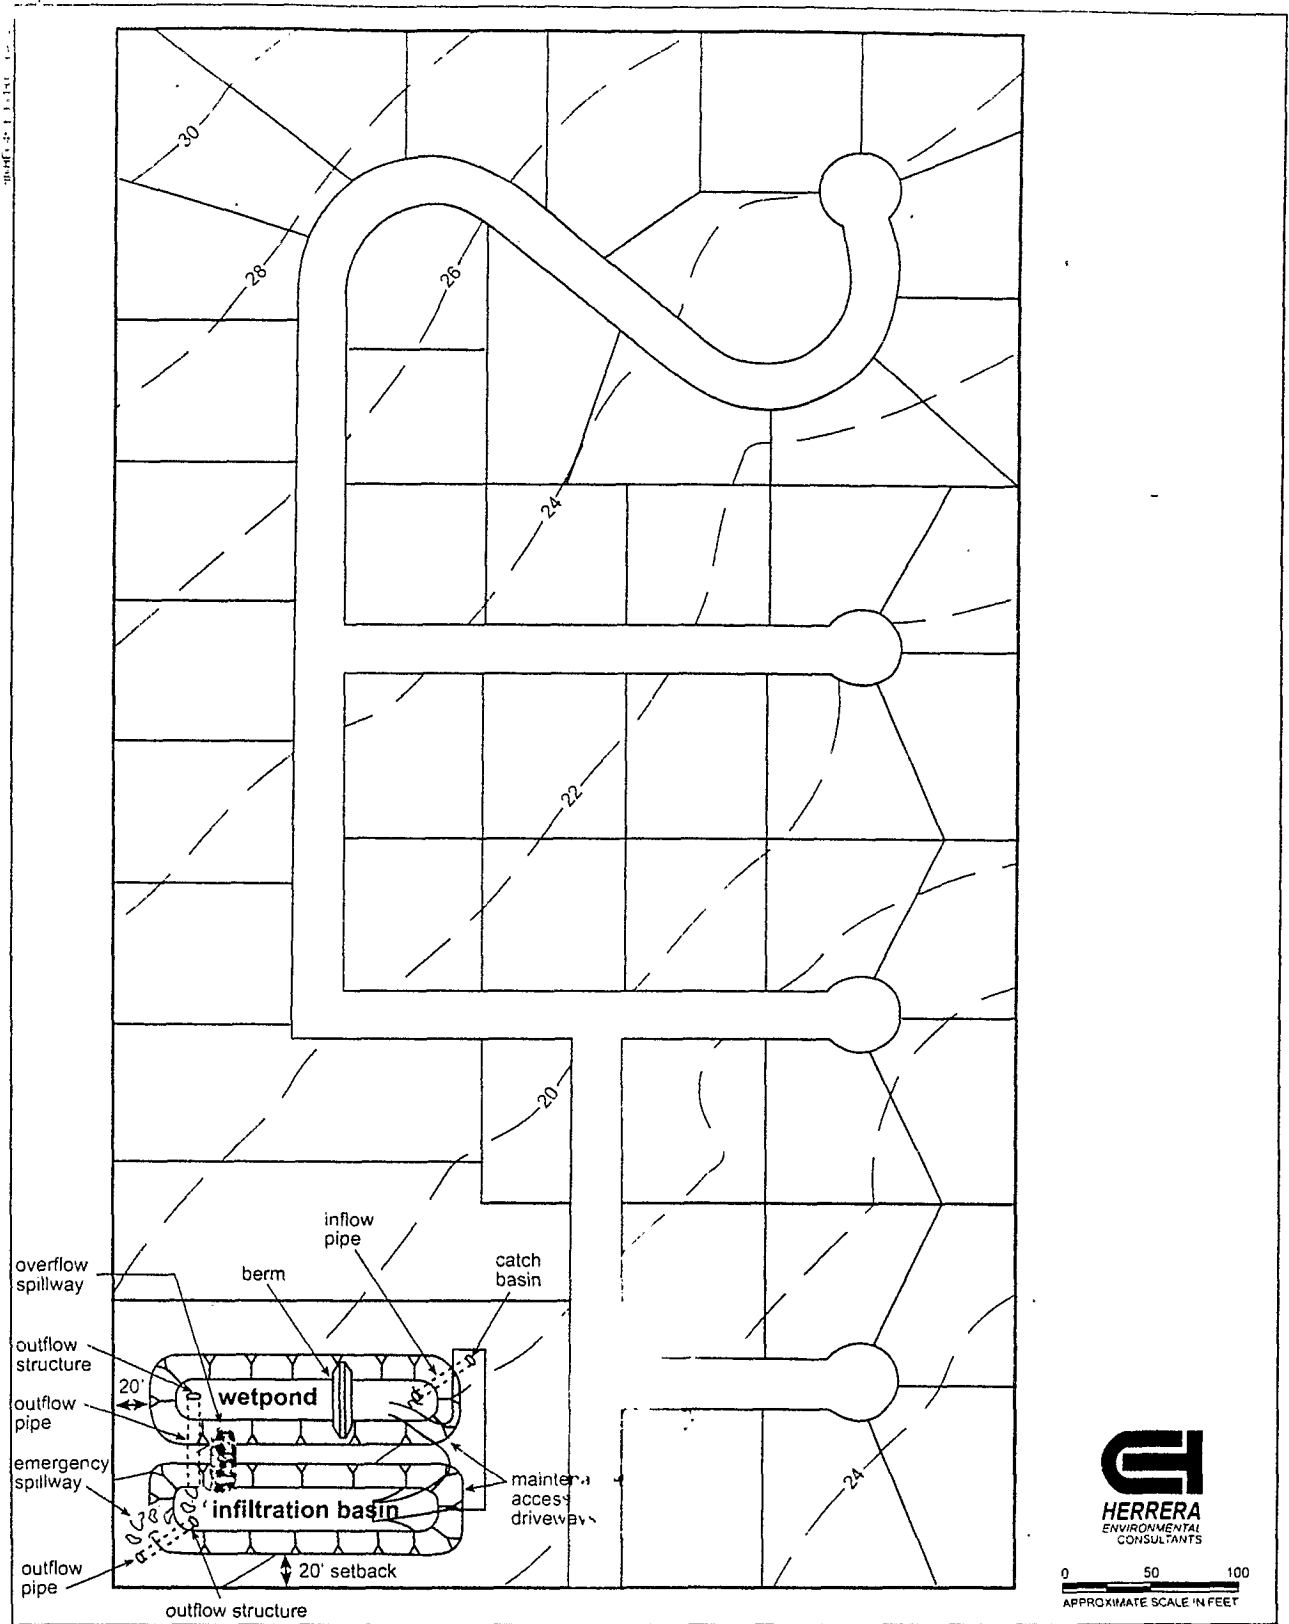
Permanent stormwater site plan BMPs for 10-acre residential development with infiltration.
